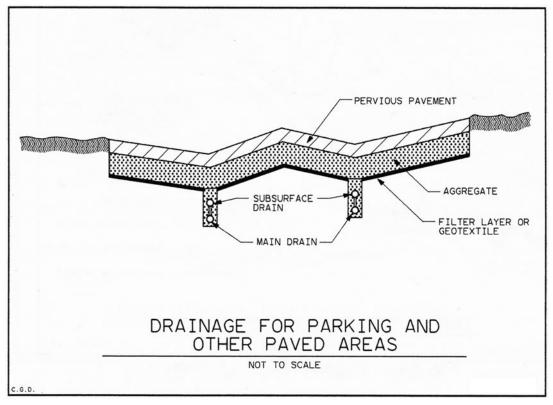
Drainage for parking and other paved areas (pervious)
